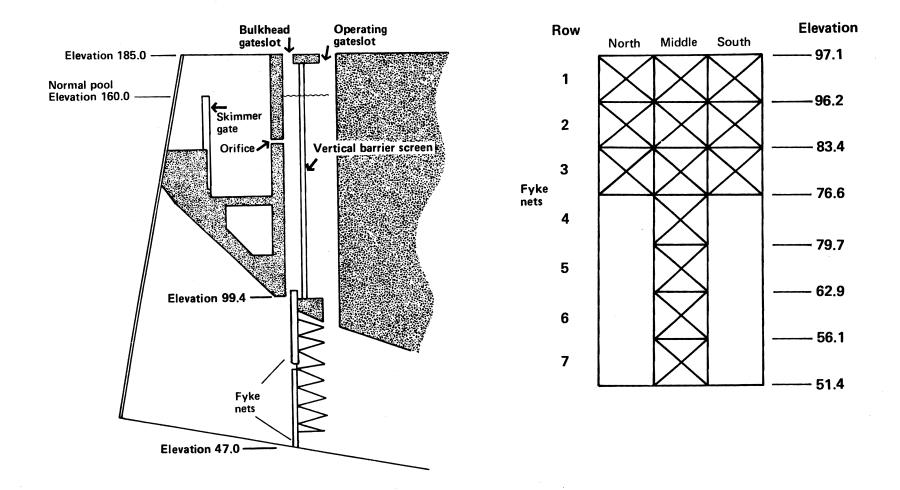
Transverse section through a typical turbine intake at The Dalles Dam showing the layout and elevations of the nets on the vertical distribution frame.
